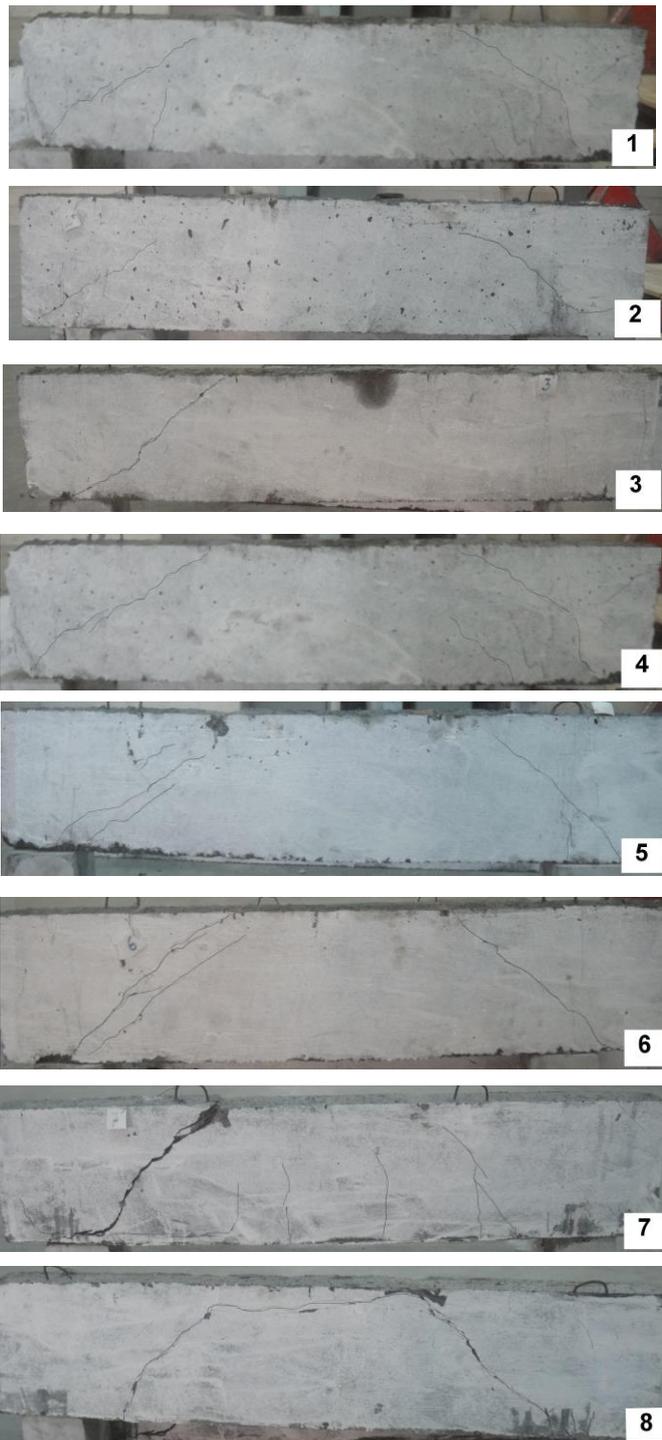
, Crack pattern of reinforced concrete beams
